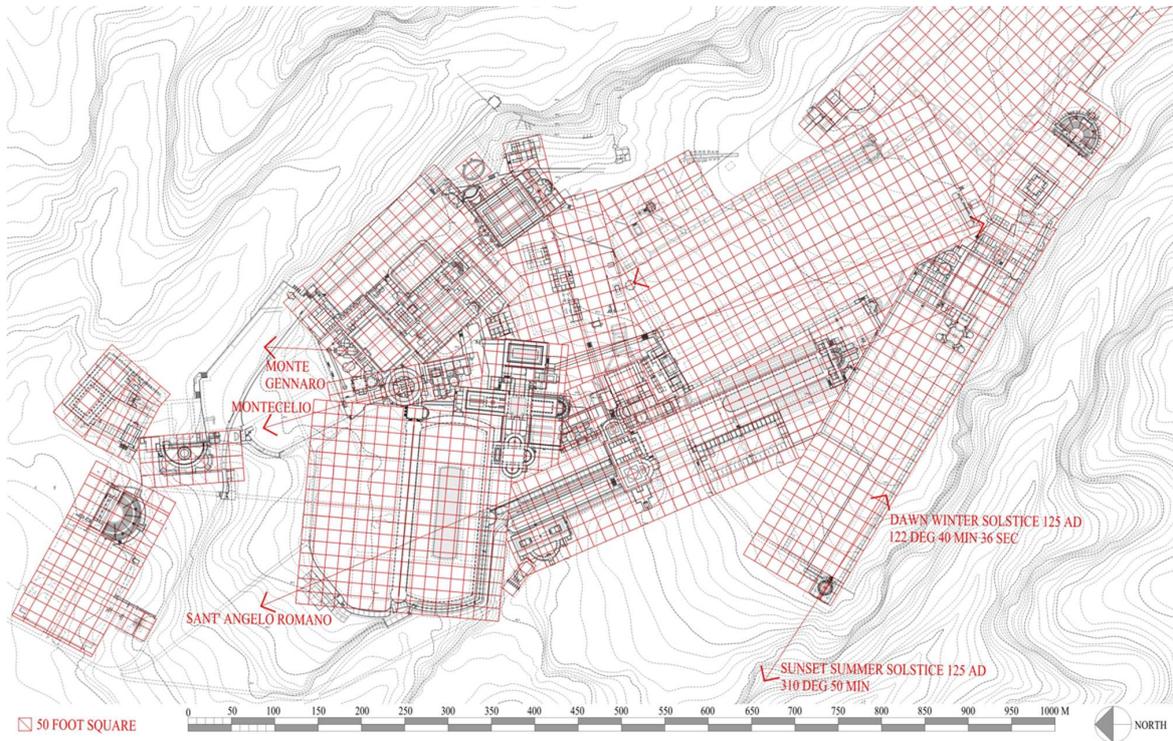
Restored plan of Hadrian's Villa with fifty foot grid overlay, author.
